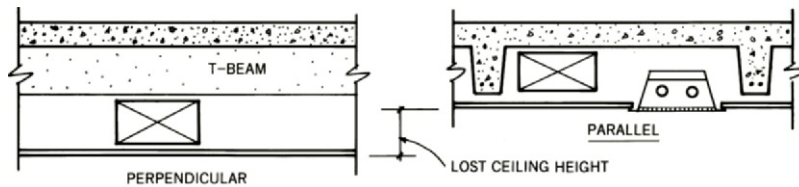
Coordinate ducts with beams and lighting fixtures to minimize the space required for the mechanical and electrical systems. Ducts should run parallel to beams.
